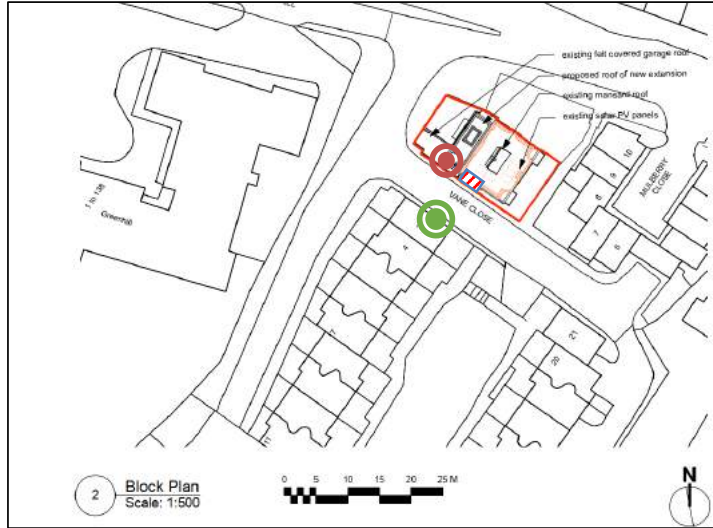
Site measurement position, identified receiver and proposed plant unit installation
